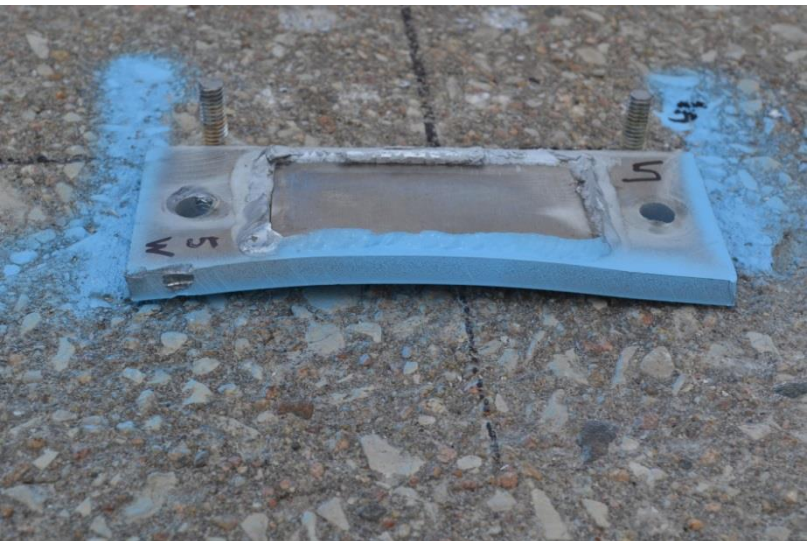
First Panel Damage, Run No. WIPR-1, Test No. WIPR-1-2
